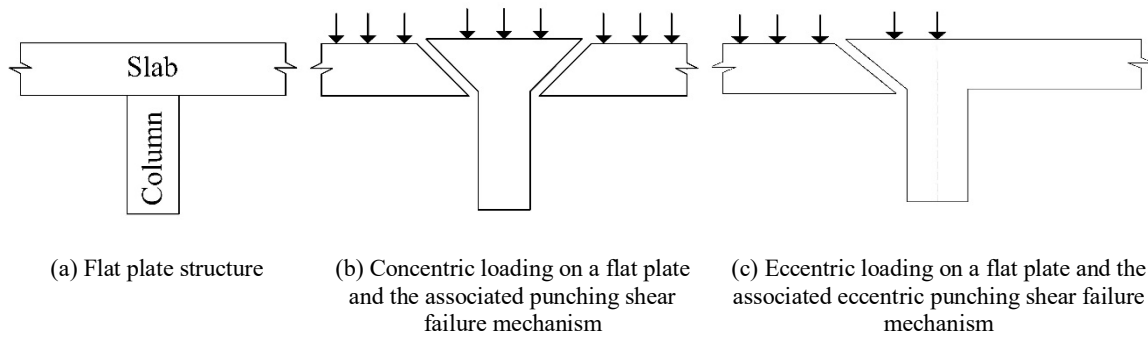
Schematic diagram of a flat slab reinforced-concrete structure
